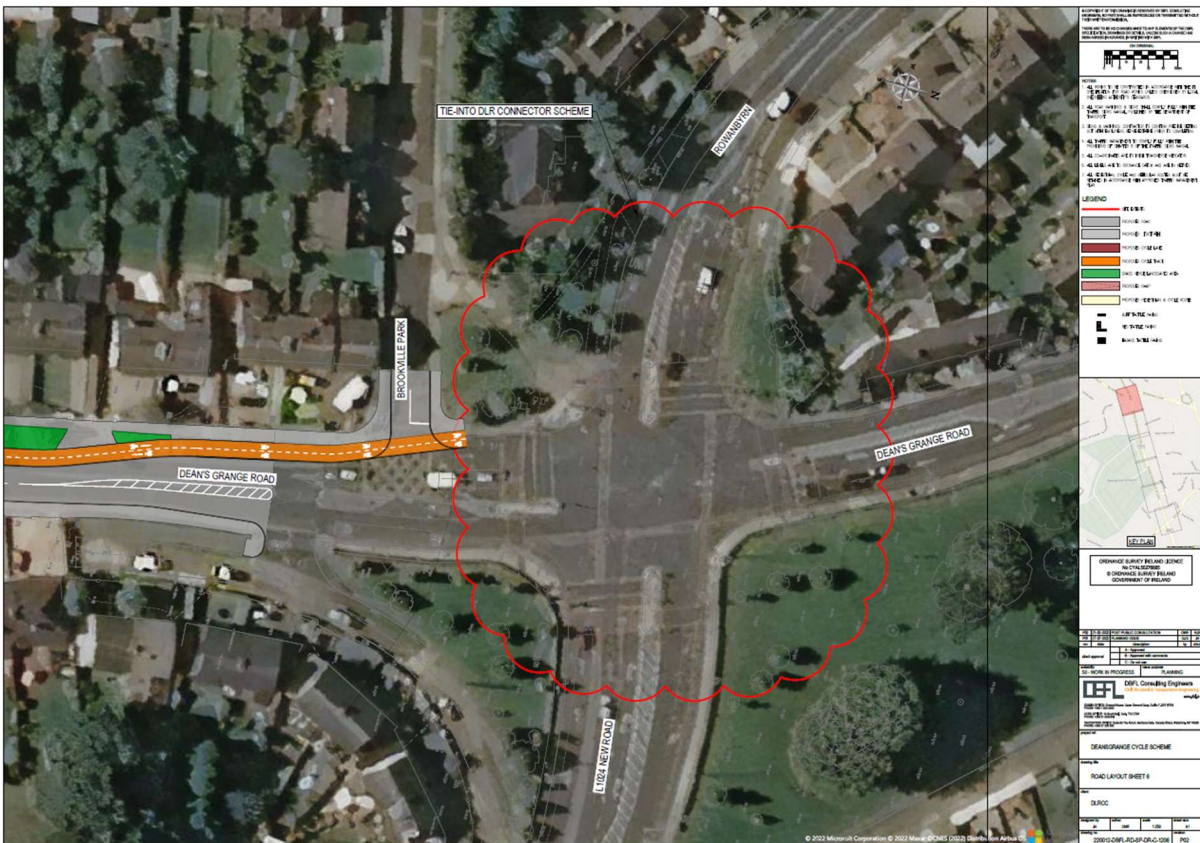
Outline design and layout of proposed scheme- Section 6 (source: DBFL Consulting Engineers)
